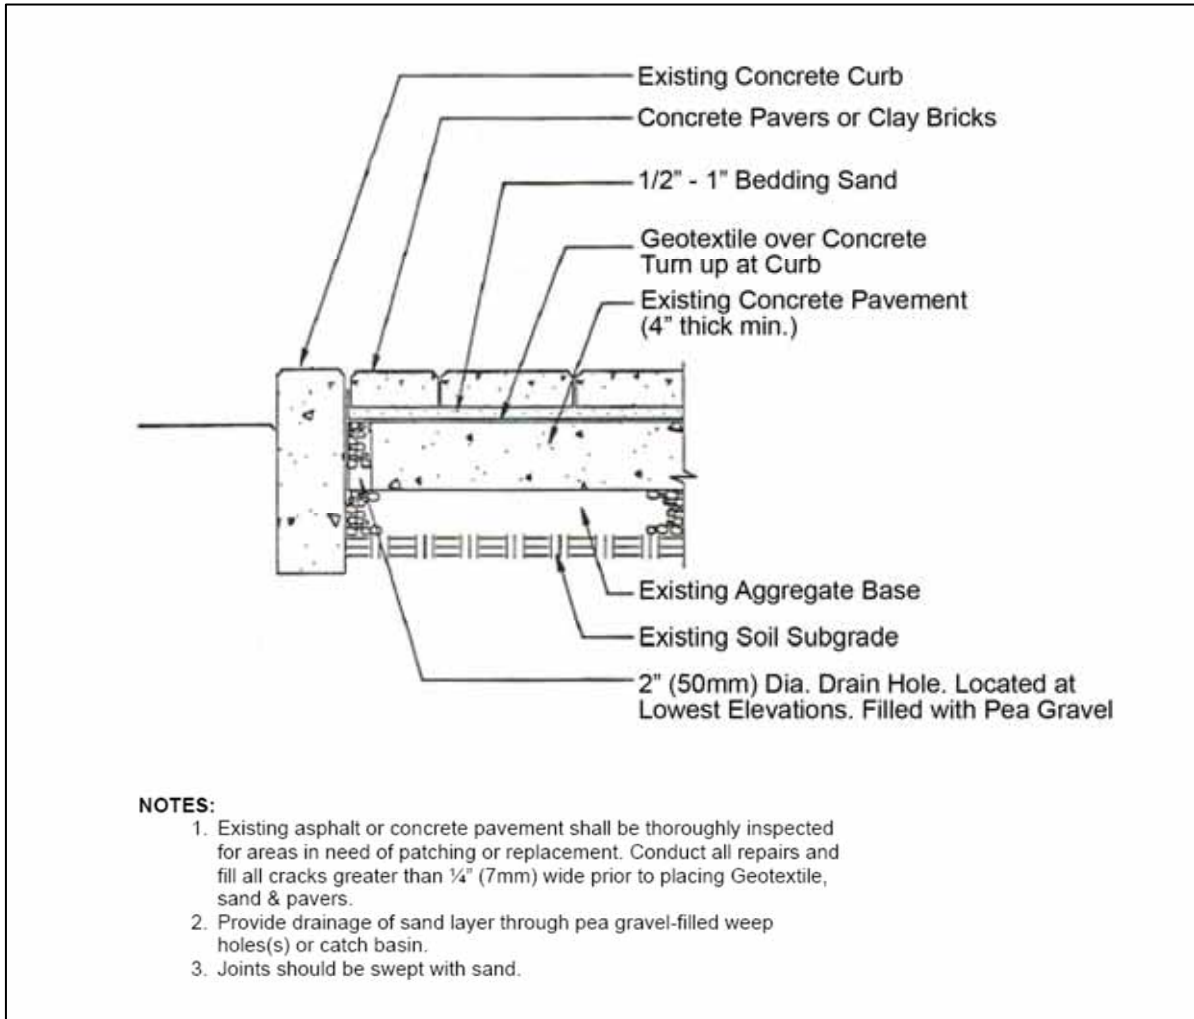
Concrete Pedestrian Pavers Installation – Sand Set over Concrete
